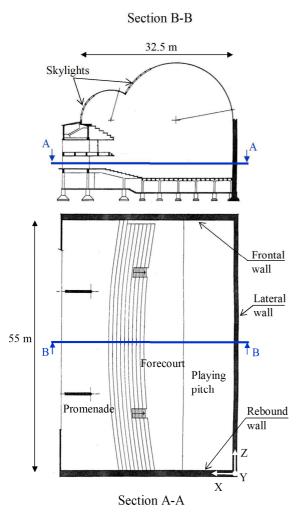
Cross section (top) and plan view (bottom) of the Frontón Recoletos building. Source Torroja [4].
